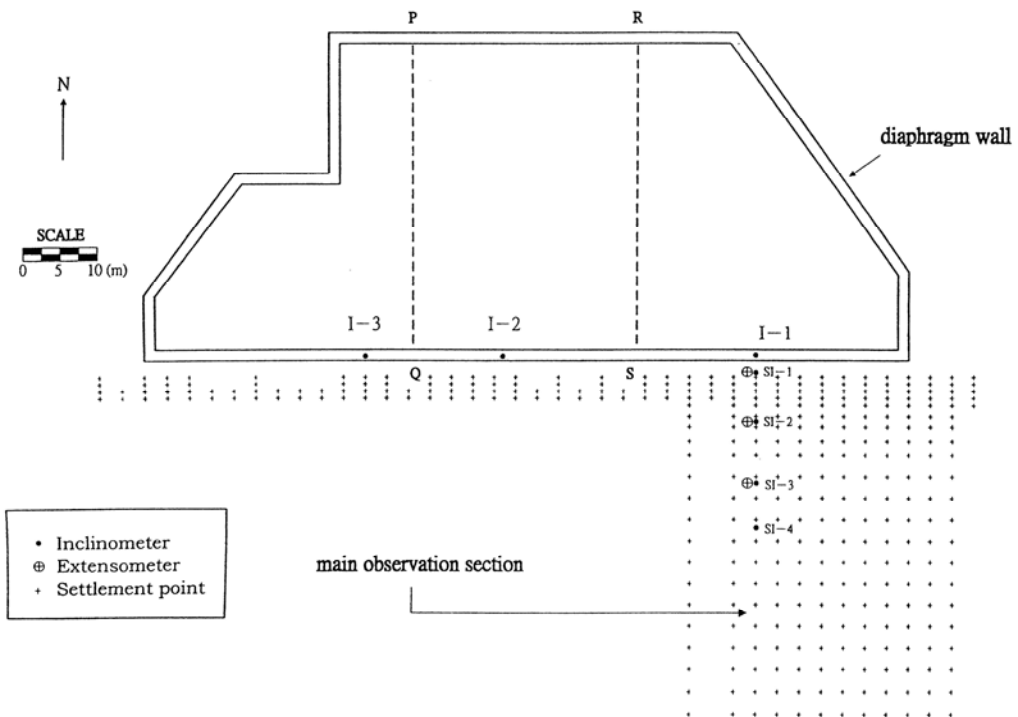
Instrumentation Monitoring at TNEC Construction (Ou, et al., 2000)
